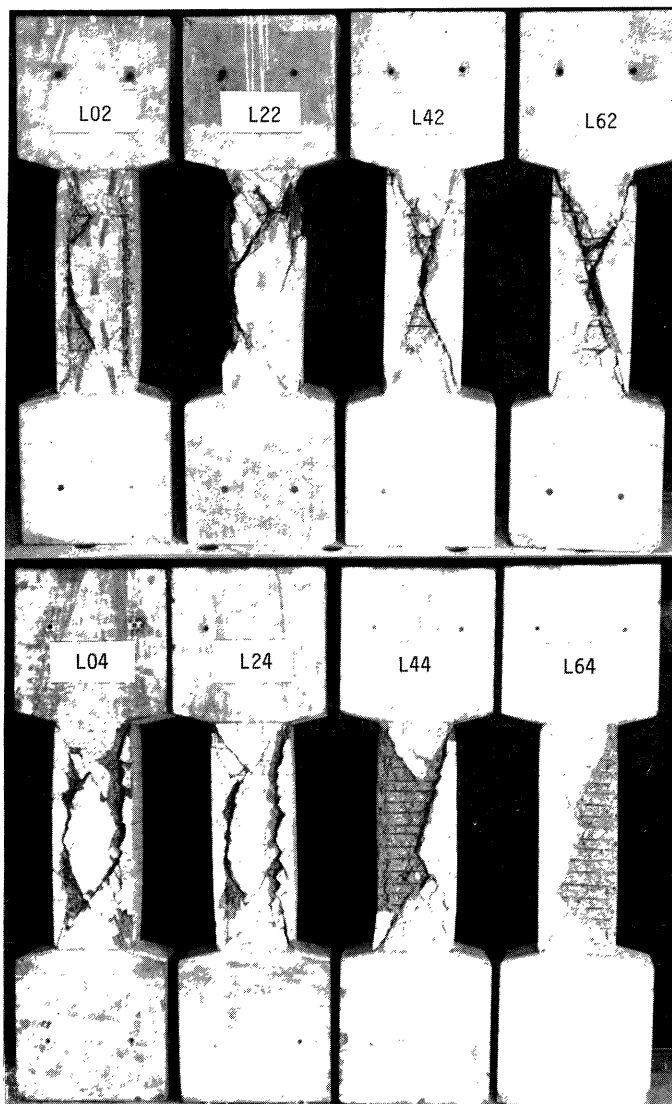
Failure modes of diagonally reinforced columns under cyclic reversed loading.
